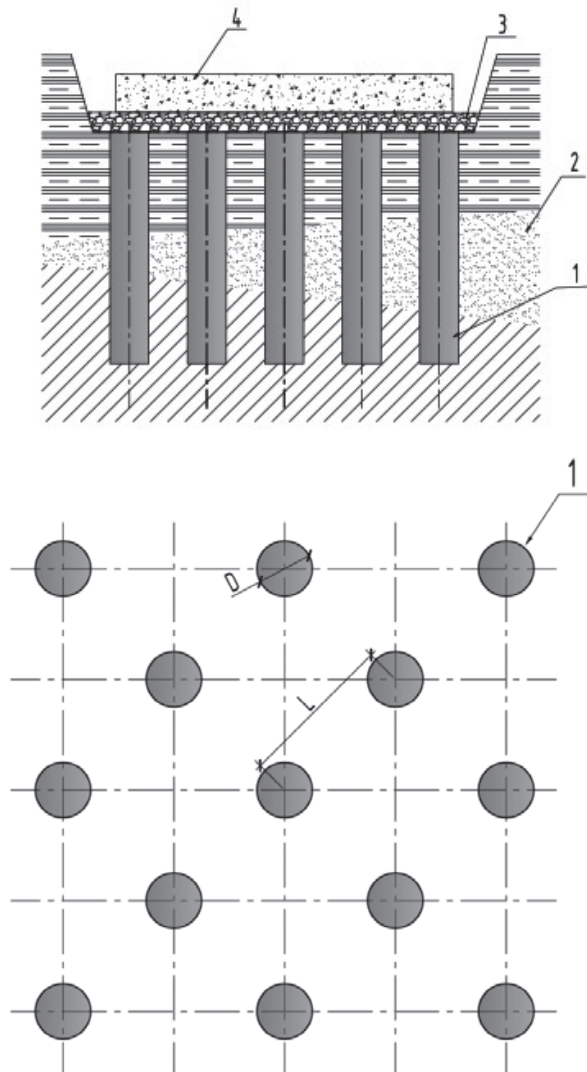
Construction of an artificial foundation "structural geotechnical solid"
